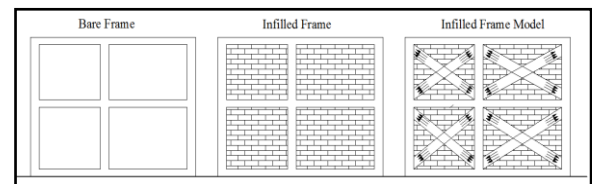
Structural layout of bare frame, infilled frame and infill frame models
